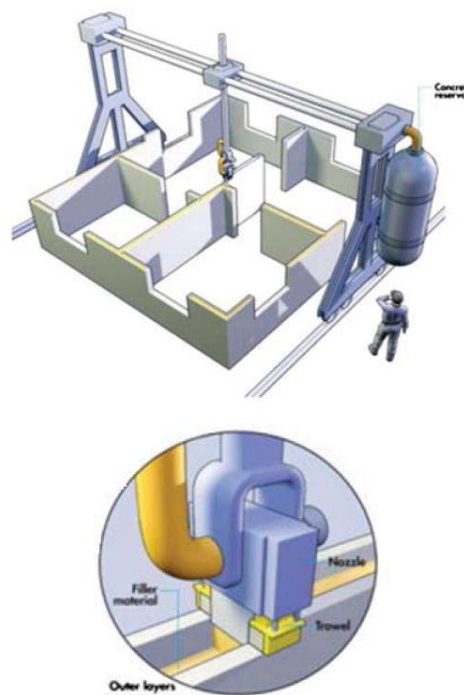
Schematic view of construction of conventional buildings using CC./ Source:Zhang and Khoshnevis 2013
